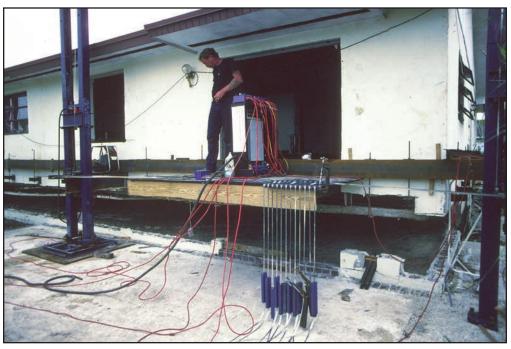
and use hangers to attach the anchors to the grid of steel beams.
